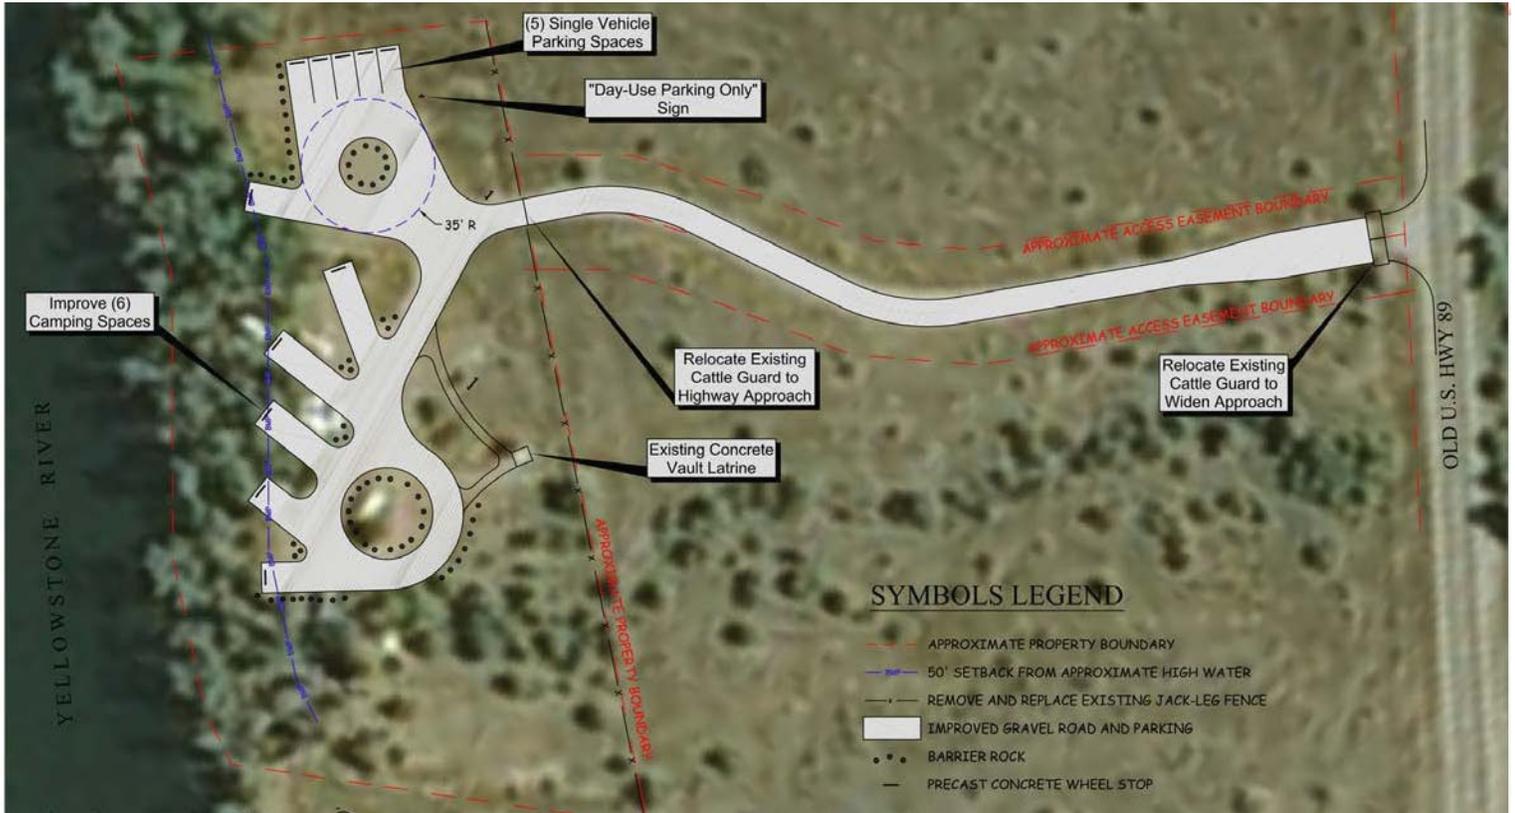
Paradise FAS Proposed Improvement Preliminary Concept Site Plan.
